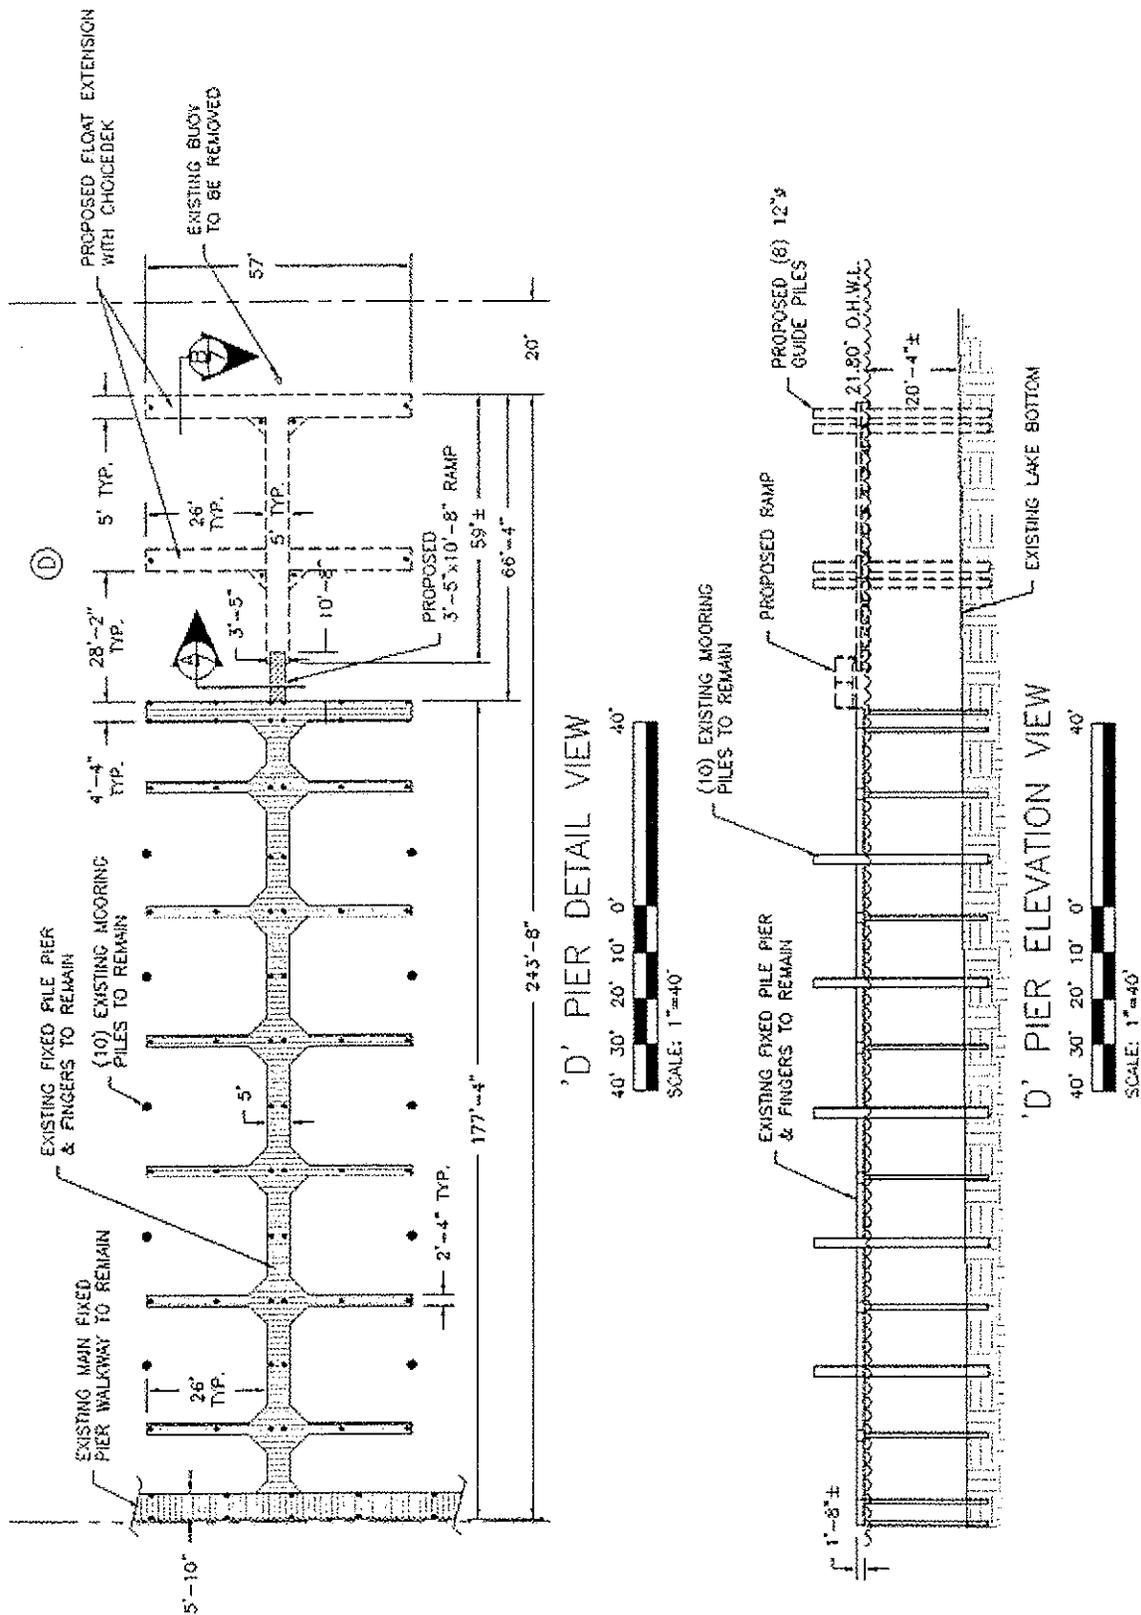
Plan and elevation views of the existing and proposed Pier D (prepared by Waterfront Construction Inc.).
